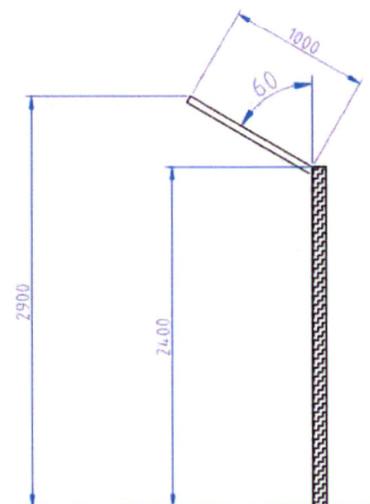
Scenario 2 – Noise Wall Cross-section
